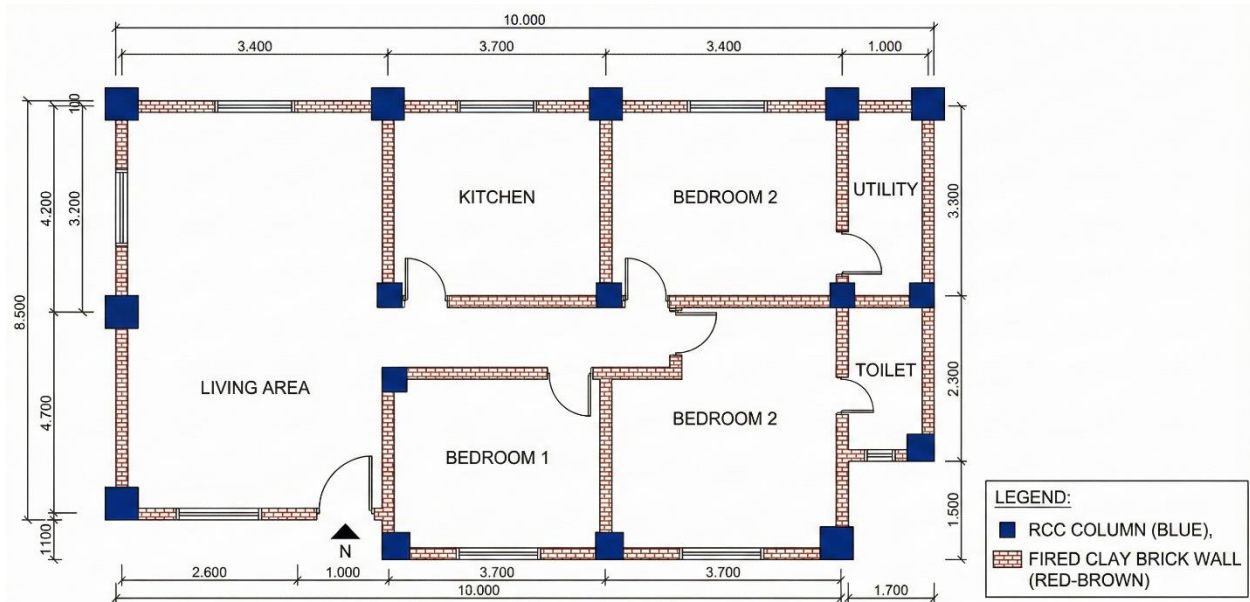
Floor Plan - Conventional Baseline (Case A)
